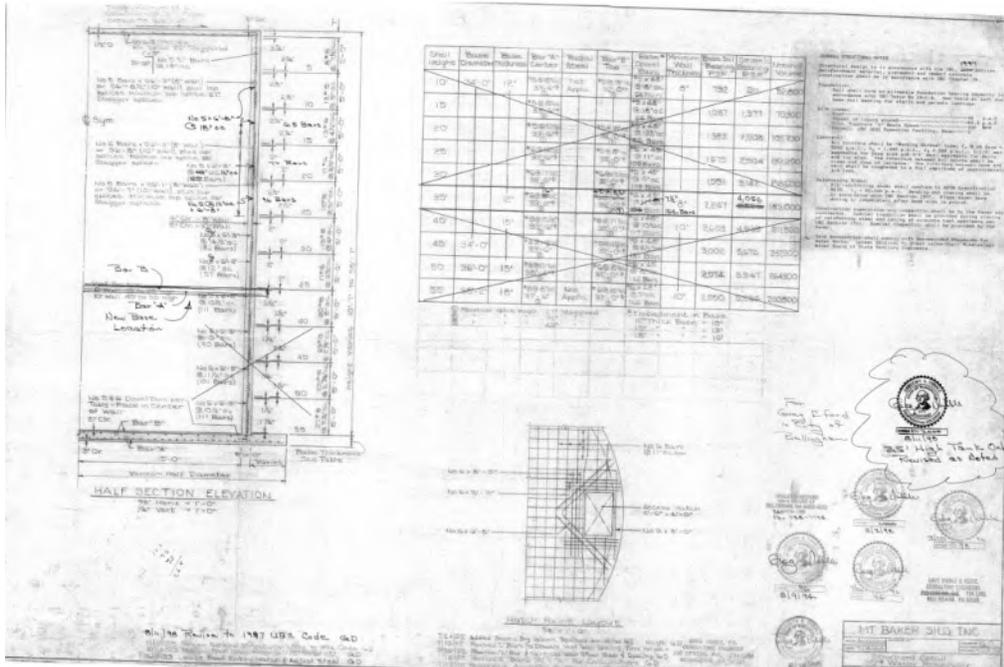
Parkhurst Reservoir – Annotated Mt Baker Silo Structural Details, Stamped by Dibble Engineering
